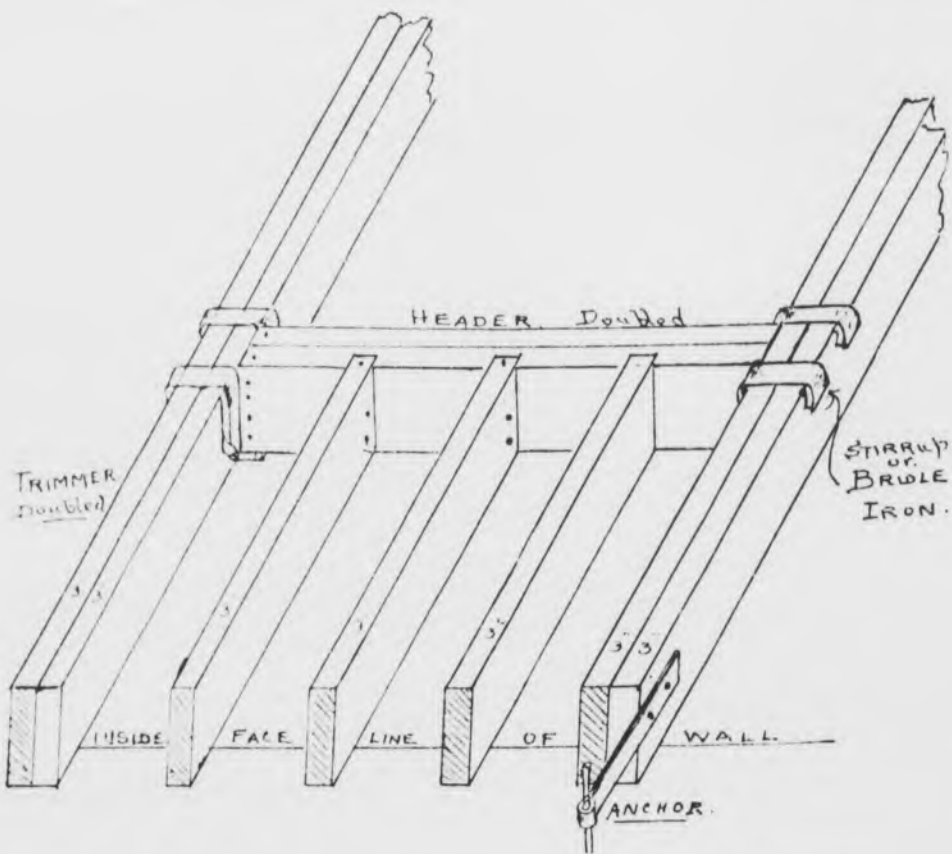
HEADERS AND TRIMMERS DOUBLED, ALSO FRAMING OF FLOOR BEAMS.
